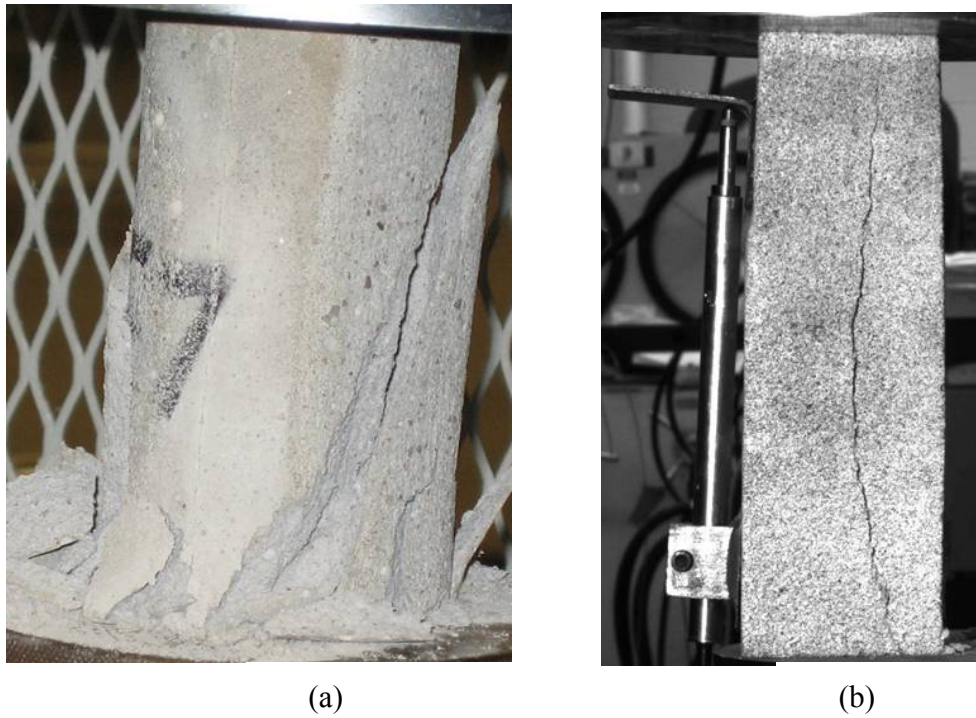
Typical failure mode for mortar specimens under compressive loading: (a) cylindrical specimen and (b) prismatic specimen
